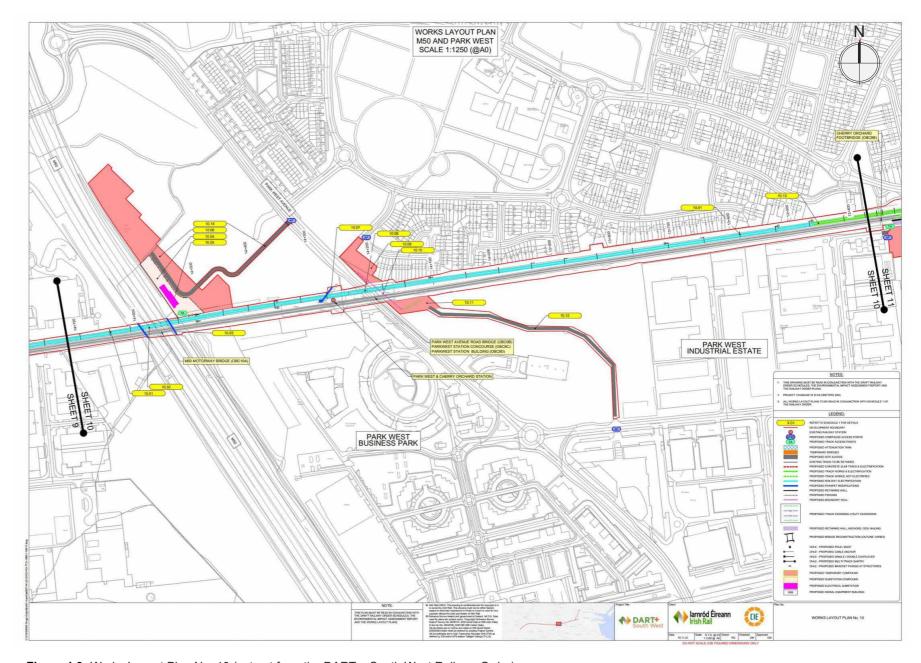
Works Layout Plan No. 10 (extract from the DART + South West Railway Order)
